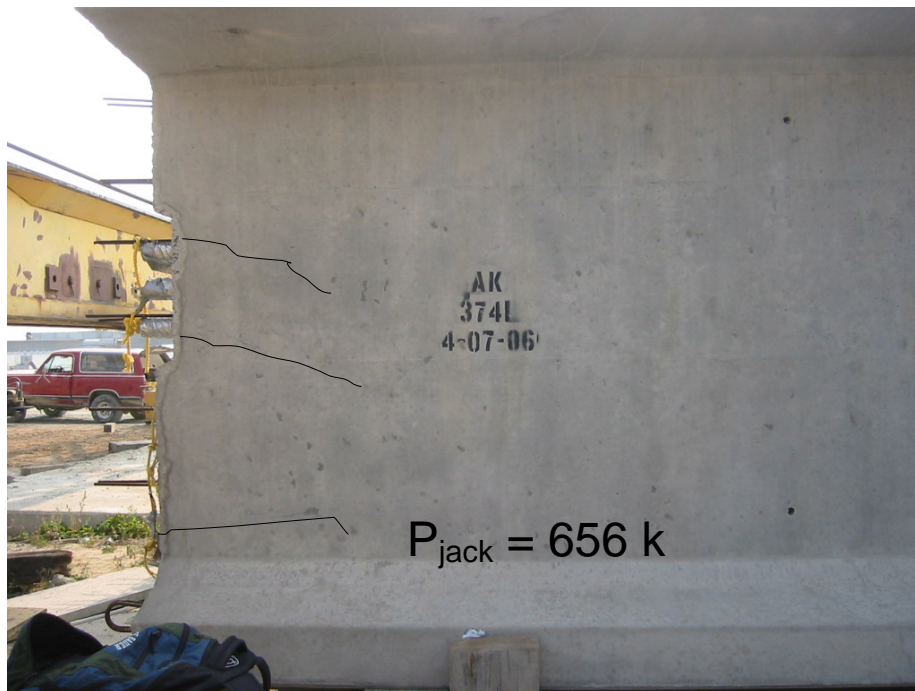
Drop-In Girder With Anchorage Zone Cracking
